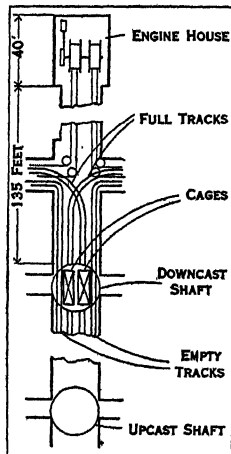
PLAN OF SHAFT SIDINGS SHOWING HAULAGE ENGINE, NAIL TRACKS, ROPES AND SHEAVES
